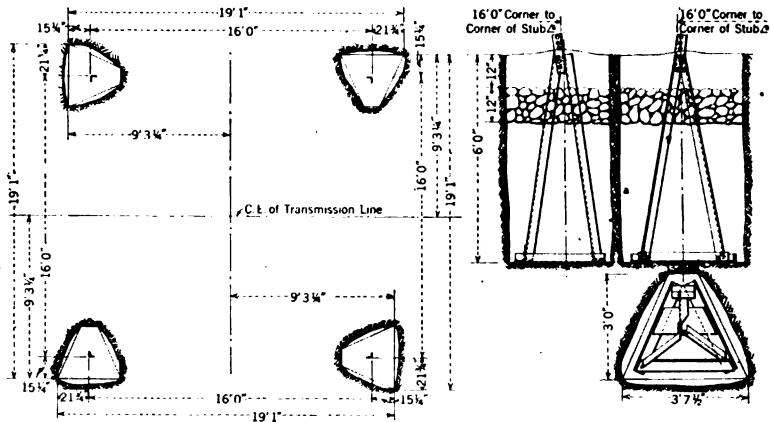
STEEL TRIPOD TYPE FOUNDATION
